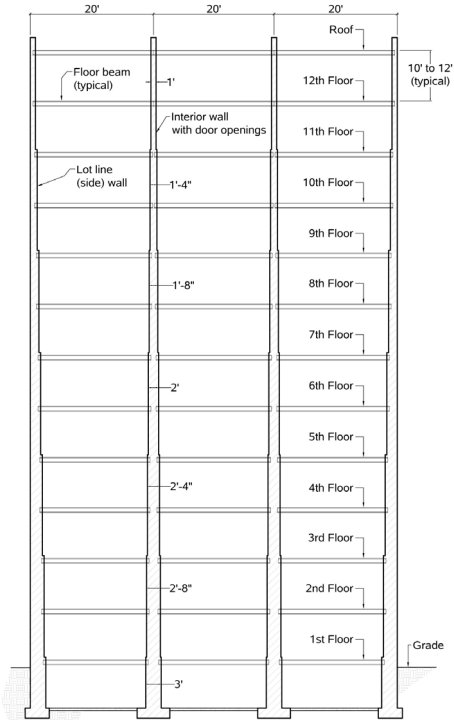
Transverse section of a bearing-wall building. Note that floors and interior partitions are not shown for clarity, and that the walls are 12 inches thick at the top and increase 4 inches for each two floors.
